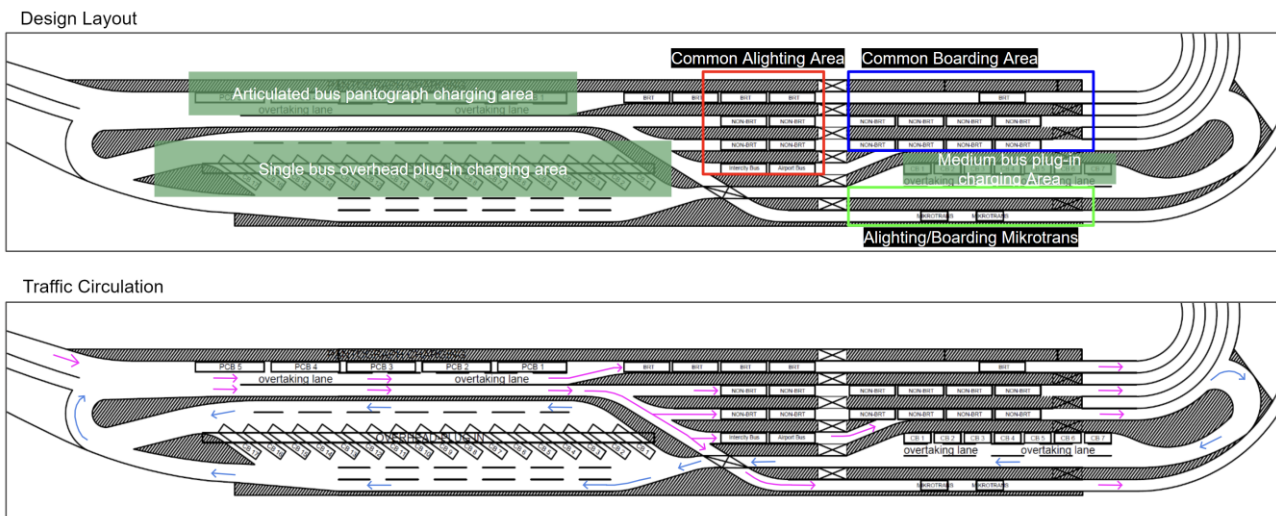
Proposed design layout and traffic circulation for e-bus charging at Blok M, alternative 2
